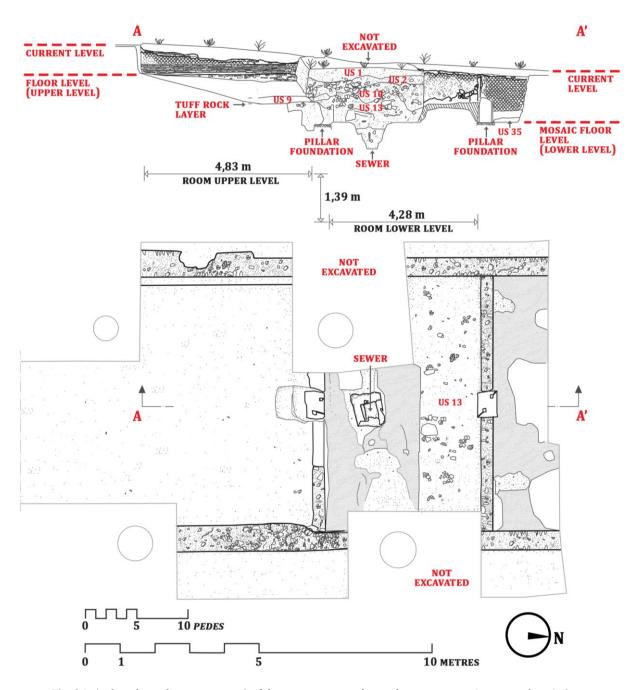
Archaeological excavation n. 2 of the western area, plan and cross-section. Image credits: A. Ottati
